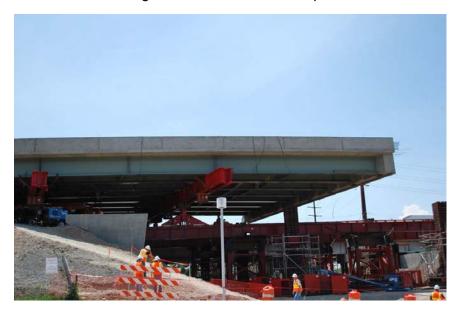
Utah DOT I-80 Westbound Bridge Installation (source: Utah DOT)
